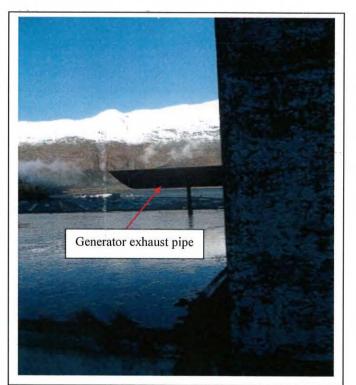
The exhaust from the basement-level generator was conveyed to the rooftop via a pipe in the stairwell; looking west. (October 22, 2014)
